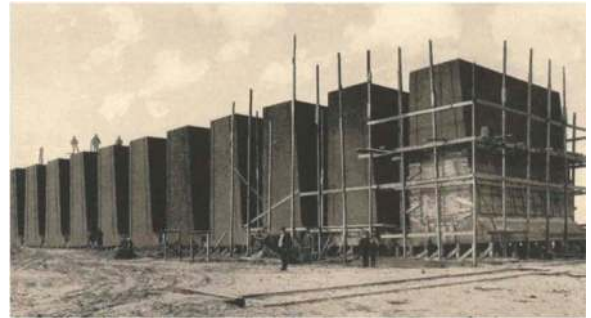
Aalborg Harbour (1906) reinforced concrete caissons.
